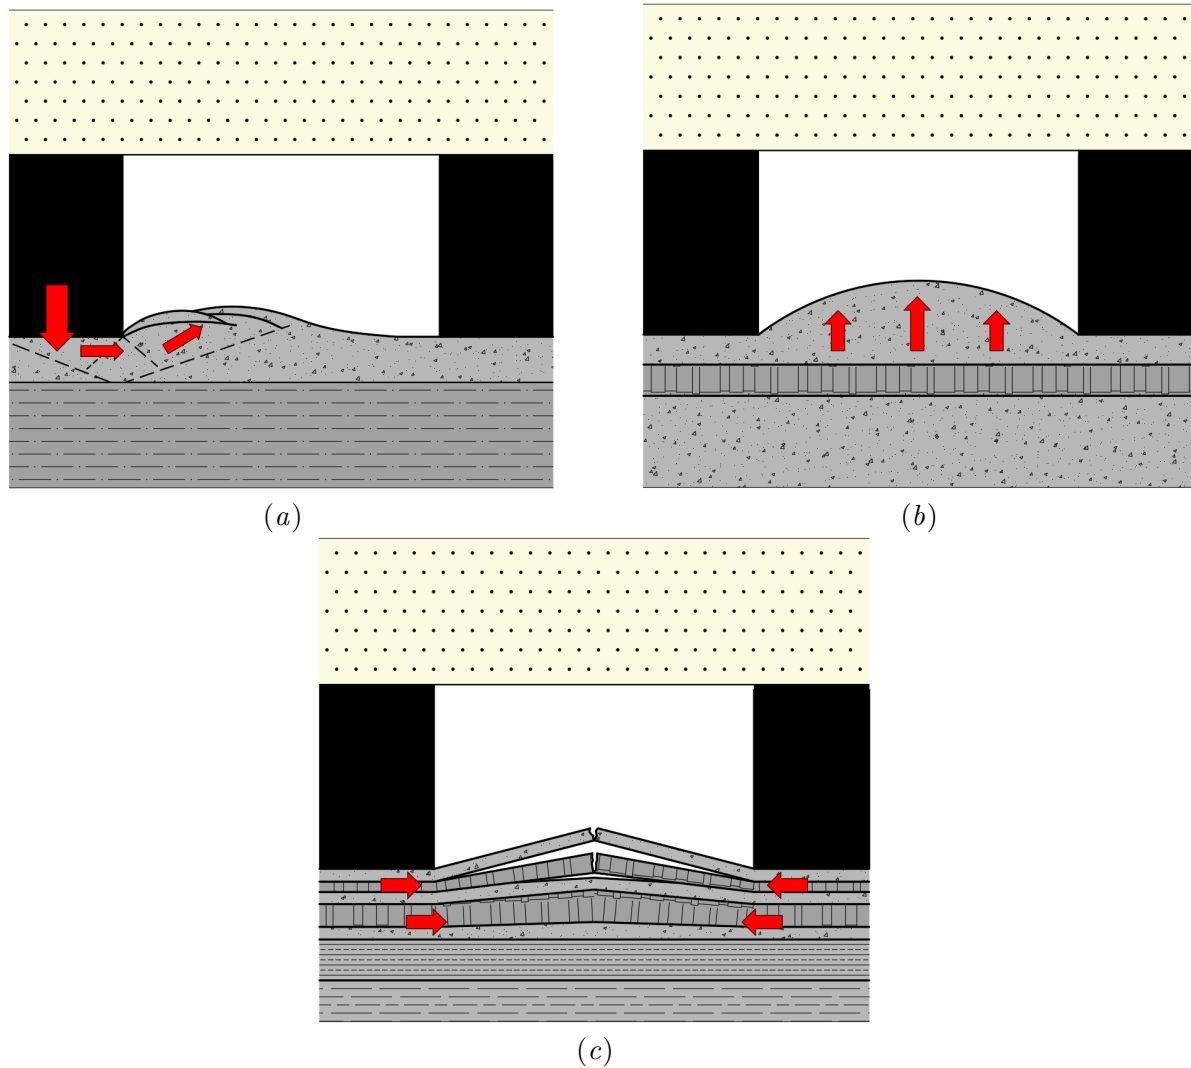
Floor heave mechanisms: (a) bearing capacity failure, (b) swelling, (c) buckling.
